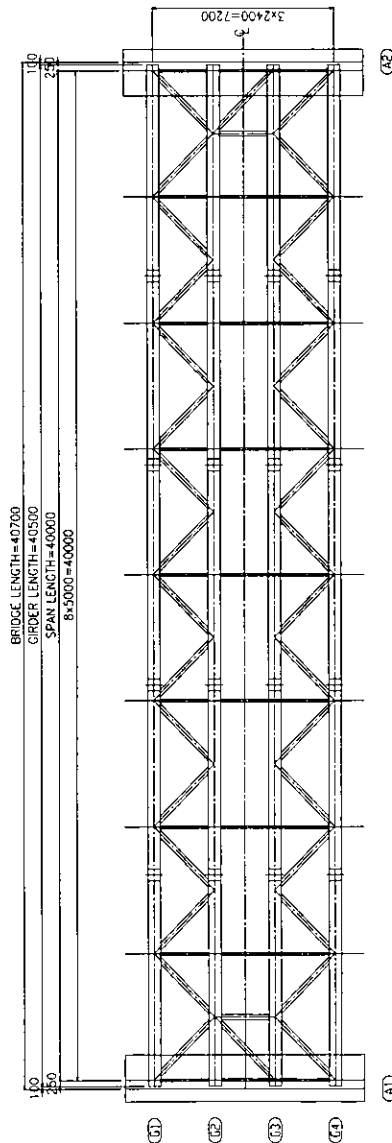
CA-04-08 TUGA BRIDGE (STRUCTURAL DRAWING)
